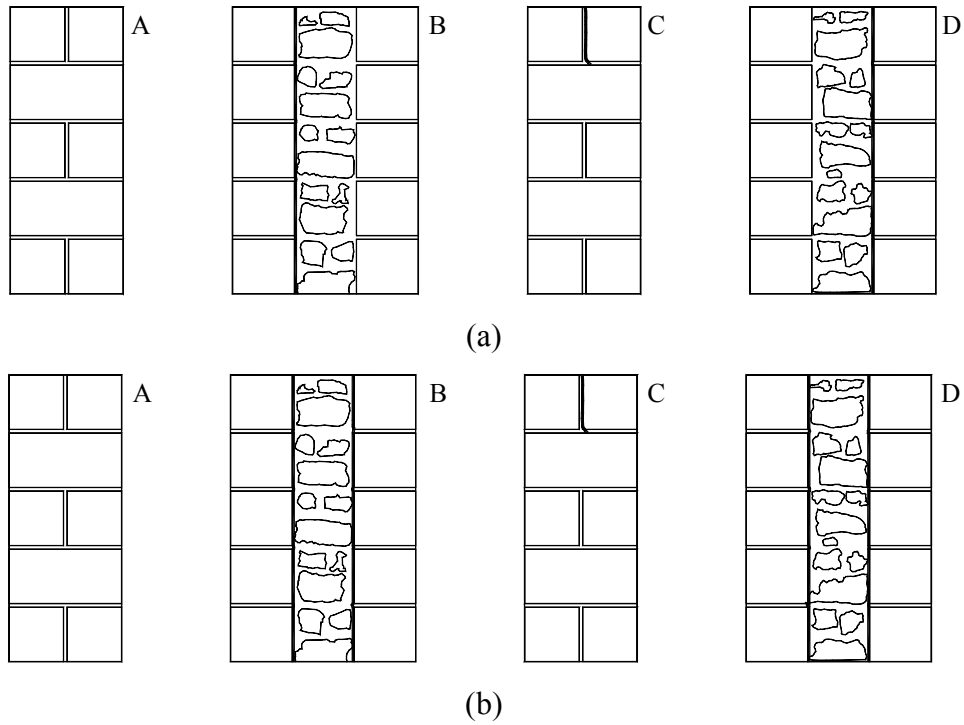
Crack pattern for *NS1* at: (a) 62 *kN* (failure of the first connection) and (b) 43 *kN* (failure of the second connection).
